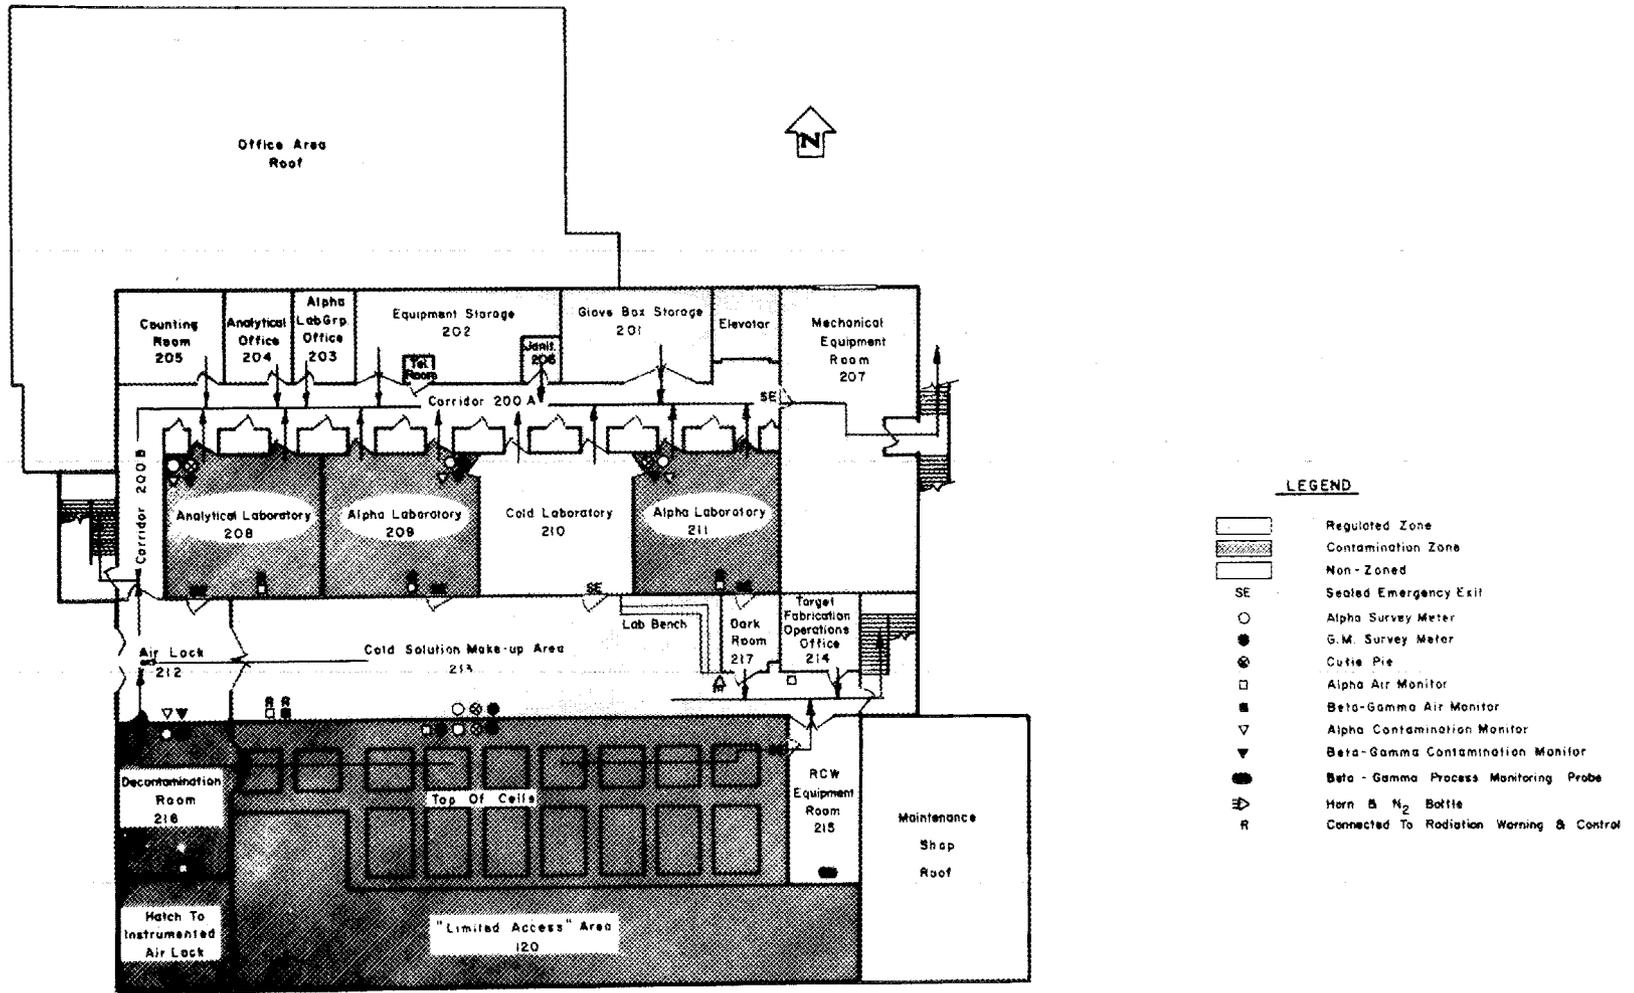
Zoning Plan - Second Floor, TRU Facility.
